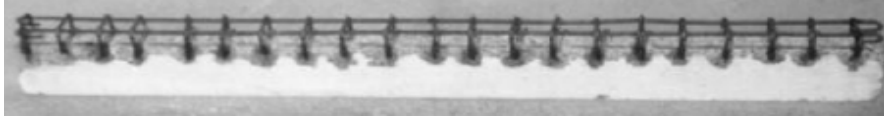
20- Reinforcement details of SBU, RSBU and CBU (Ozturk et al. 2002).
